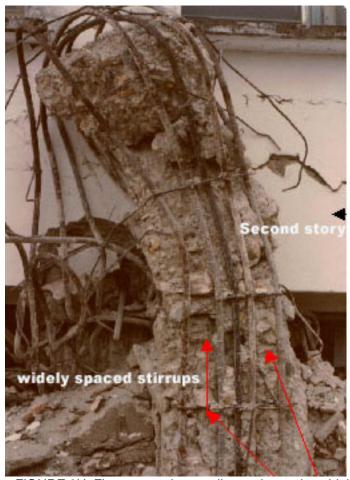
H: First-story column collapse due to the widely spaced stirrups and poor quality of aggregate
